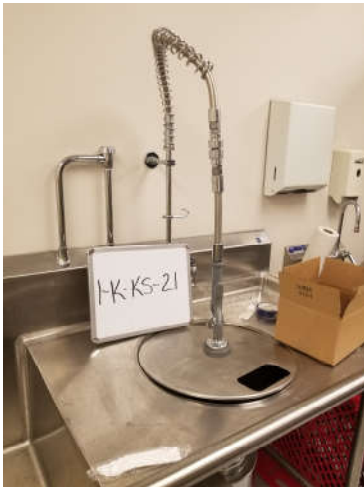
Kitchen sink, on the 1st floor in the kitchen. From left to right.
